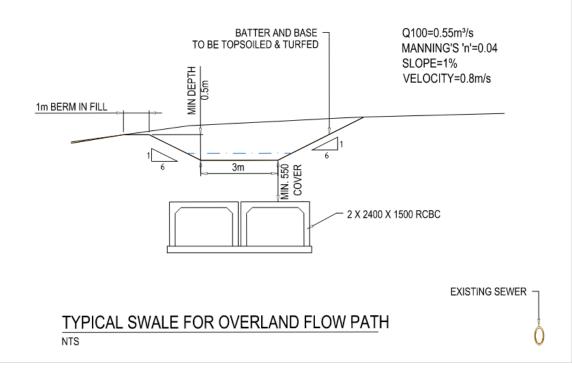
Typical Cross Section of Inter-allotment Drainage Line & Swale
